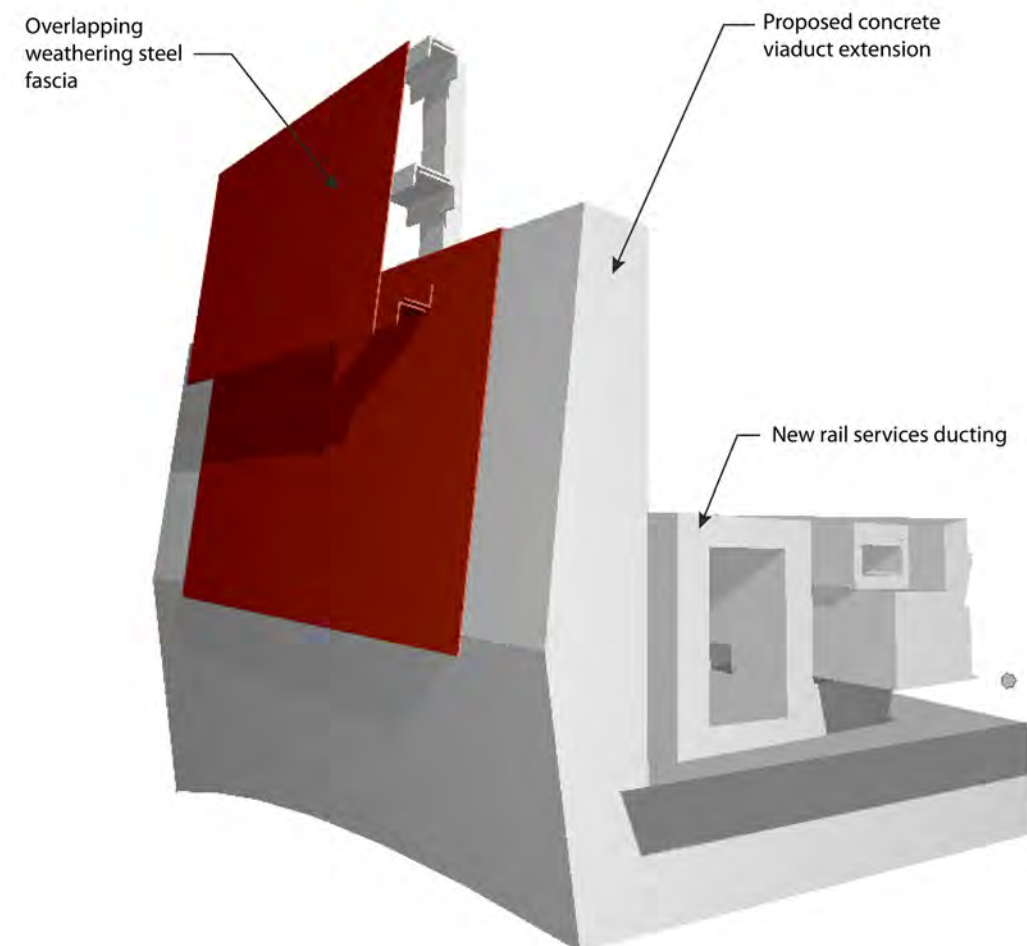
ii 3D view of parapet detail (relevant to stages A and F)
